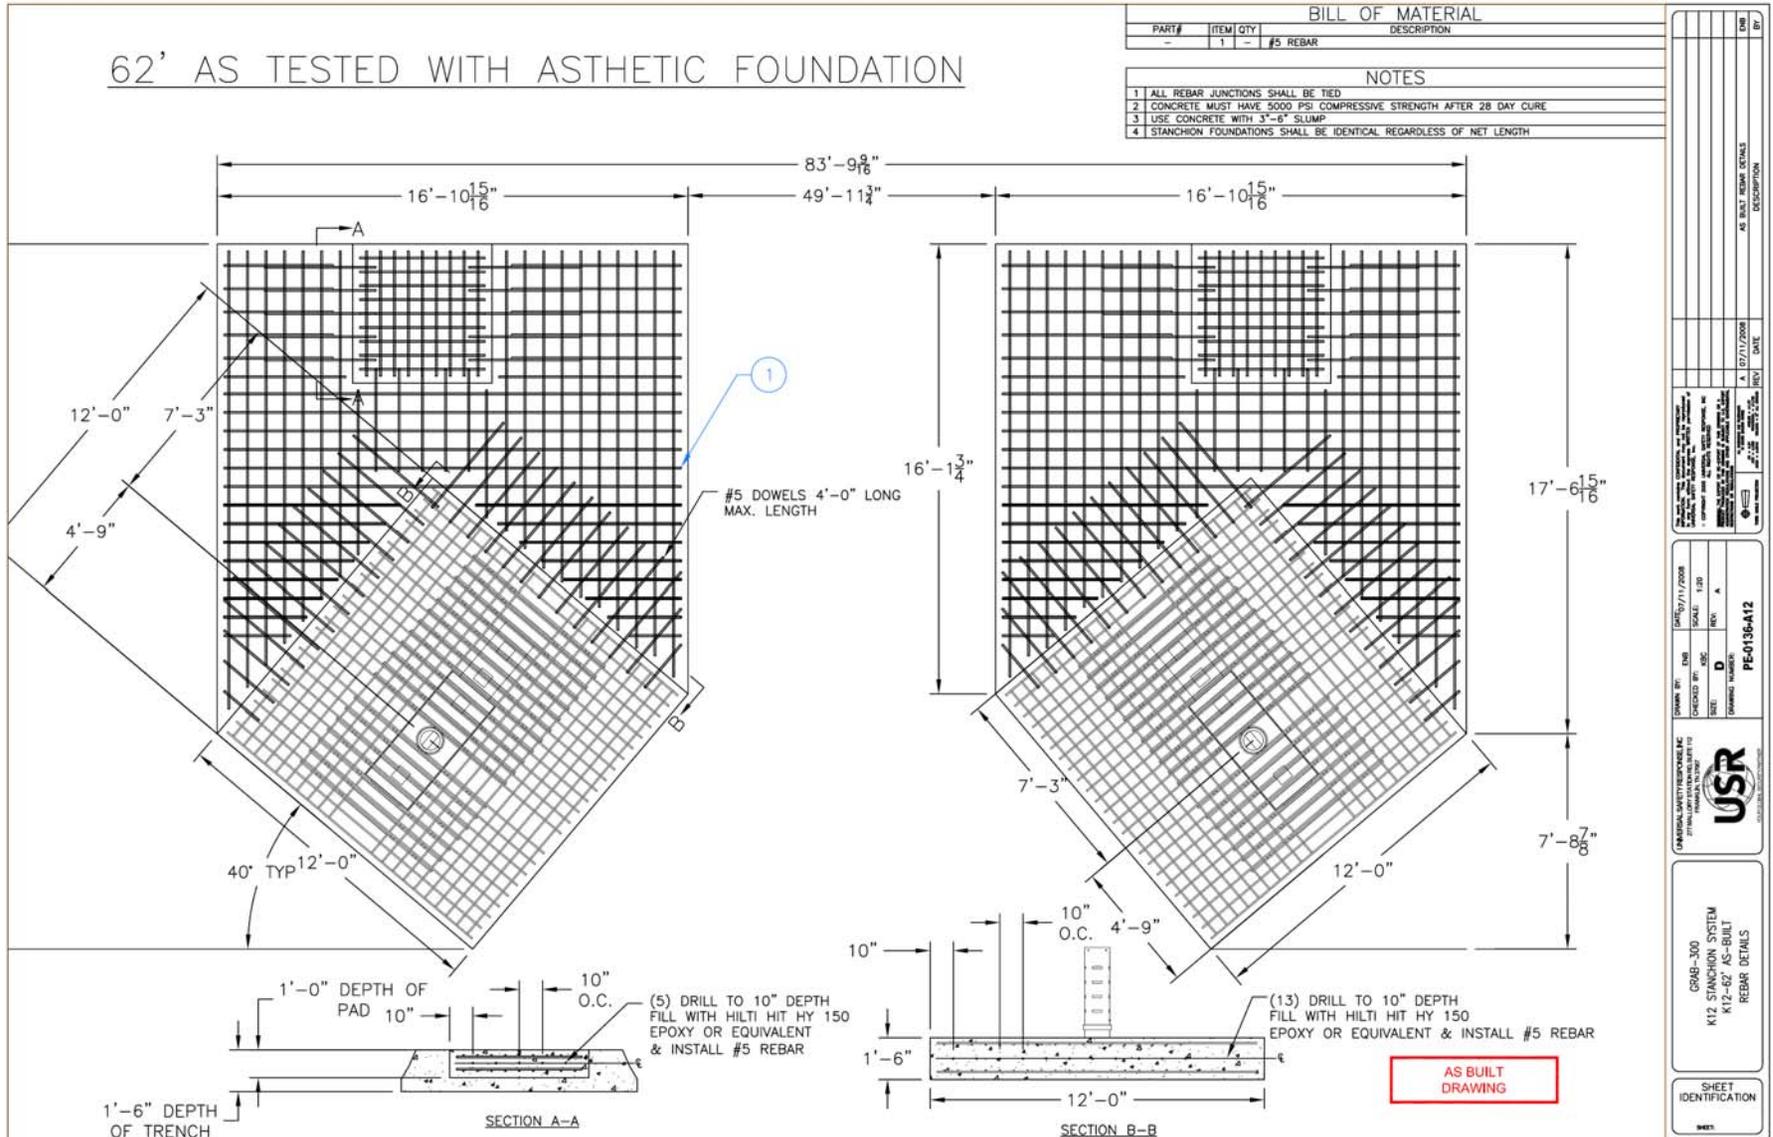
Details of the GRAB-300 62-ft barrier net – stanchion system rebar details..
